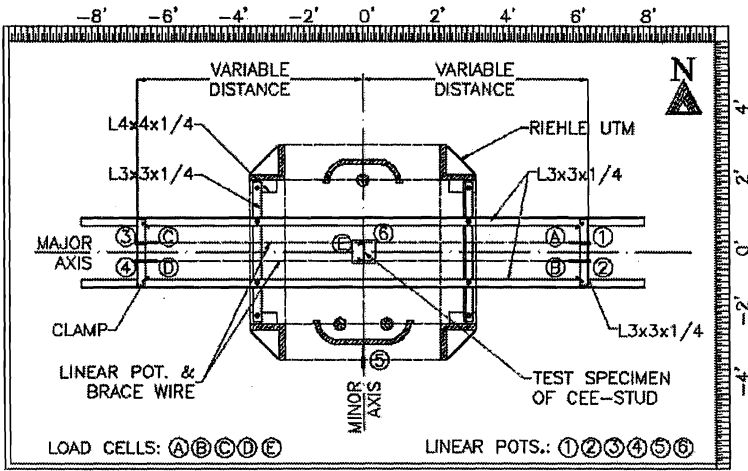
Plan View of Single Column Axial Test Setup in Riehle UTM
